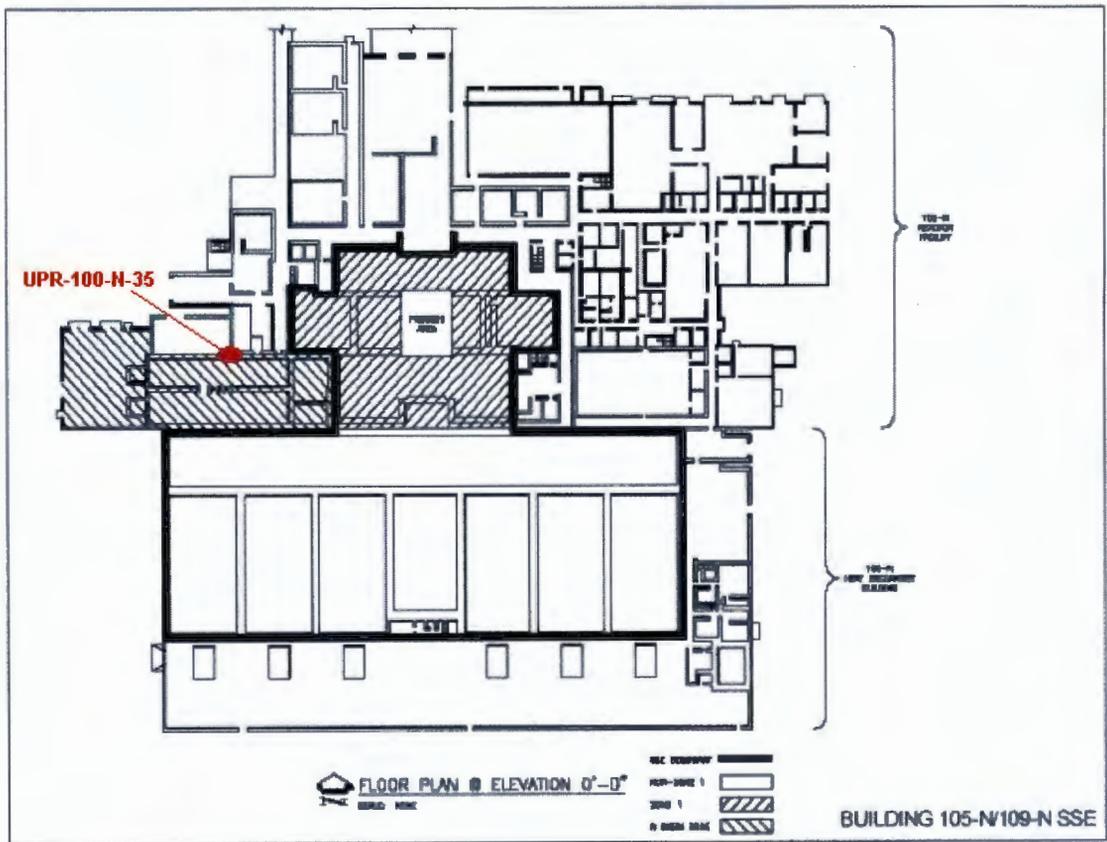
Floor Plan of the 105-N Reactor Facility and 109-N Heat Exchanger Building.
